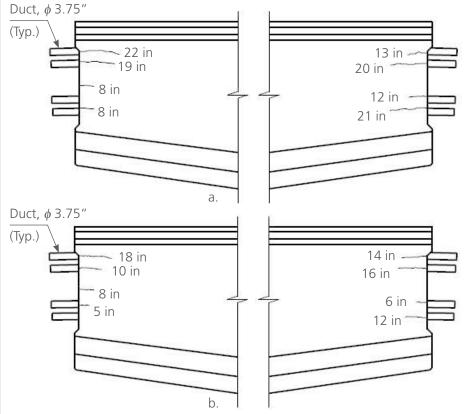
Crack pattern of haunch girders, (a) Girder P2-4NB, (b) Girder P3-1NB (1in =25.4 mm)
